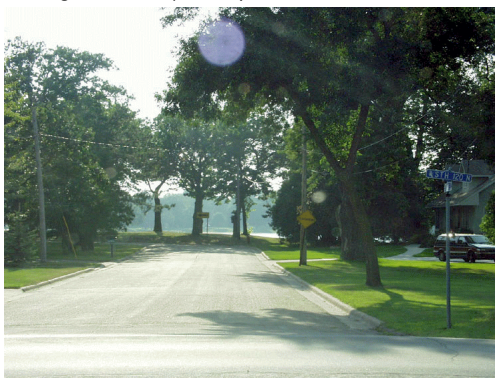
looking west along 20th Ave. from Hwy. 120 toward the park. The trail would be on the right side of the road.
